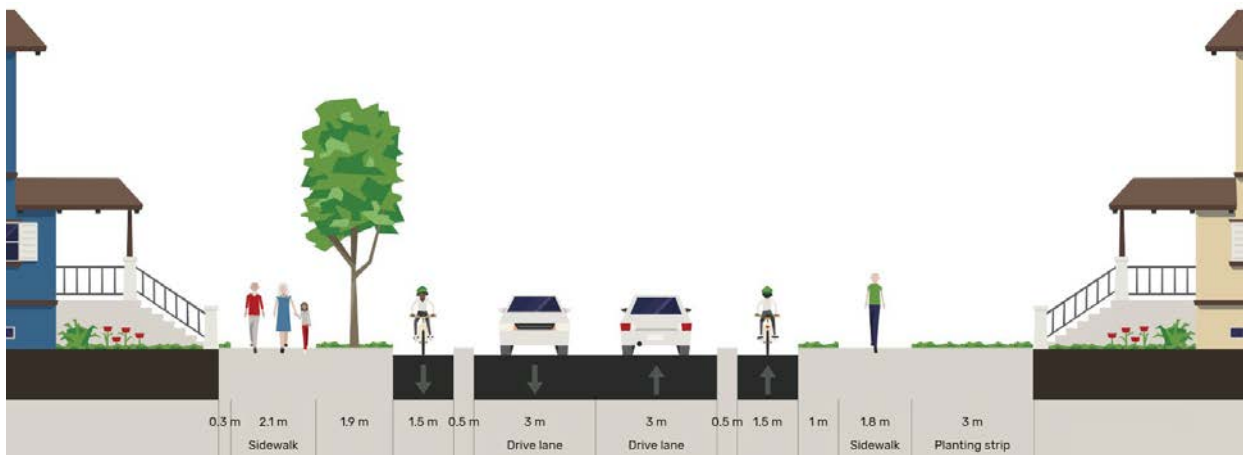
Potential Modified Alma St Cross Section (North of West Fourth Ave) with existing road width – protected bicycle lanes and new boulevard strip on eastern side of street, with no on-street parking
